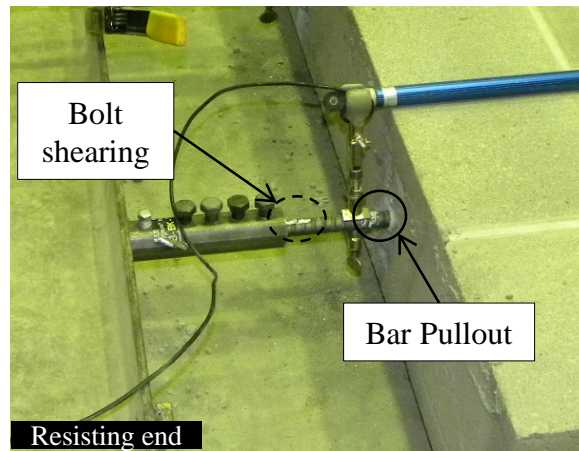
Combined bar pullout and coupler failure observed in specimen P200-6.
